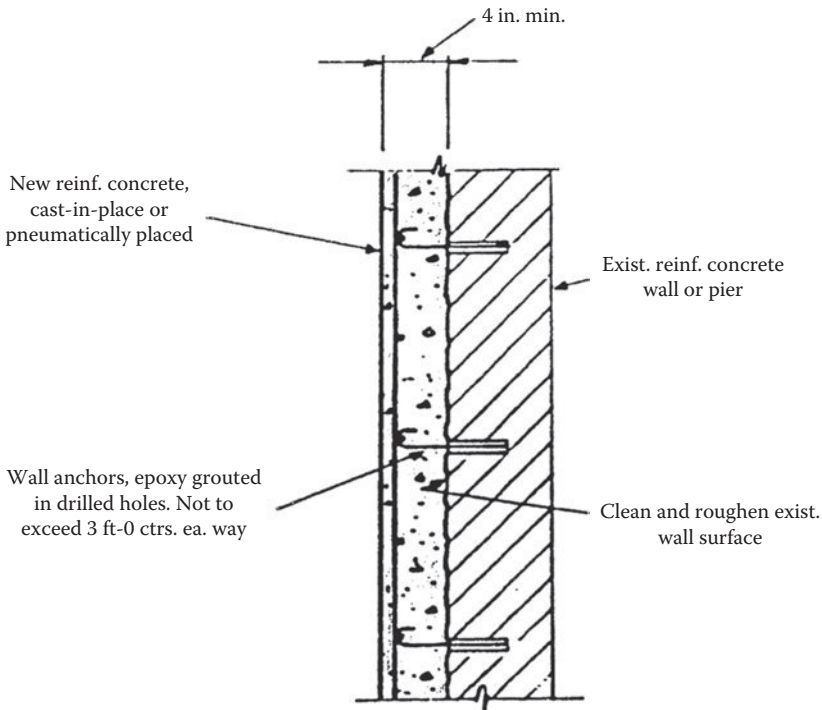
Strengthening of existing reinforced concrete wall or piers.
